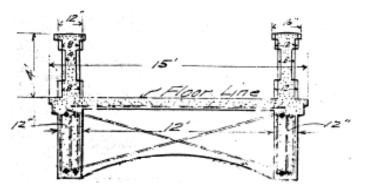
Typical cross section of the bridge near the center of the arch span (from the original design plans).
